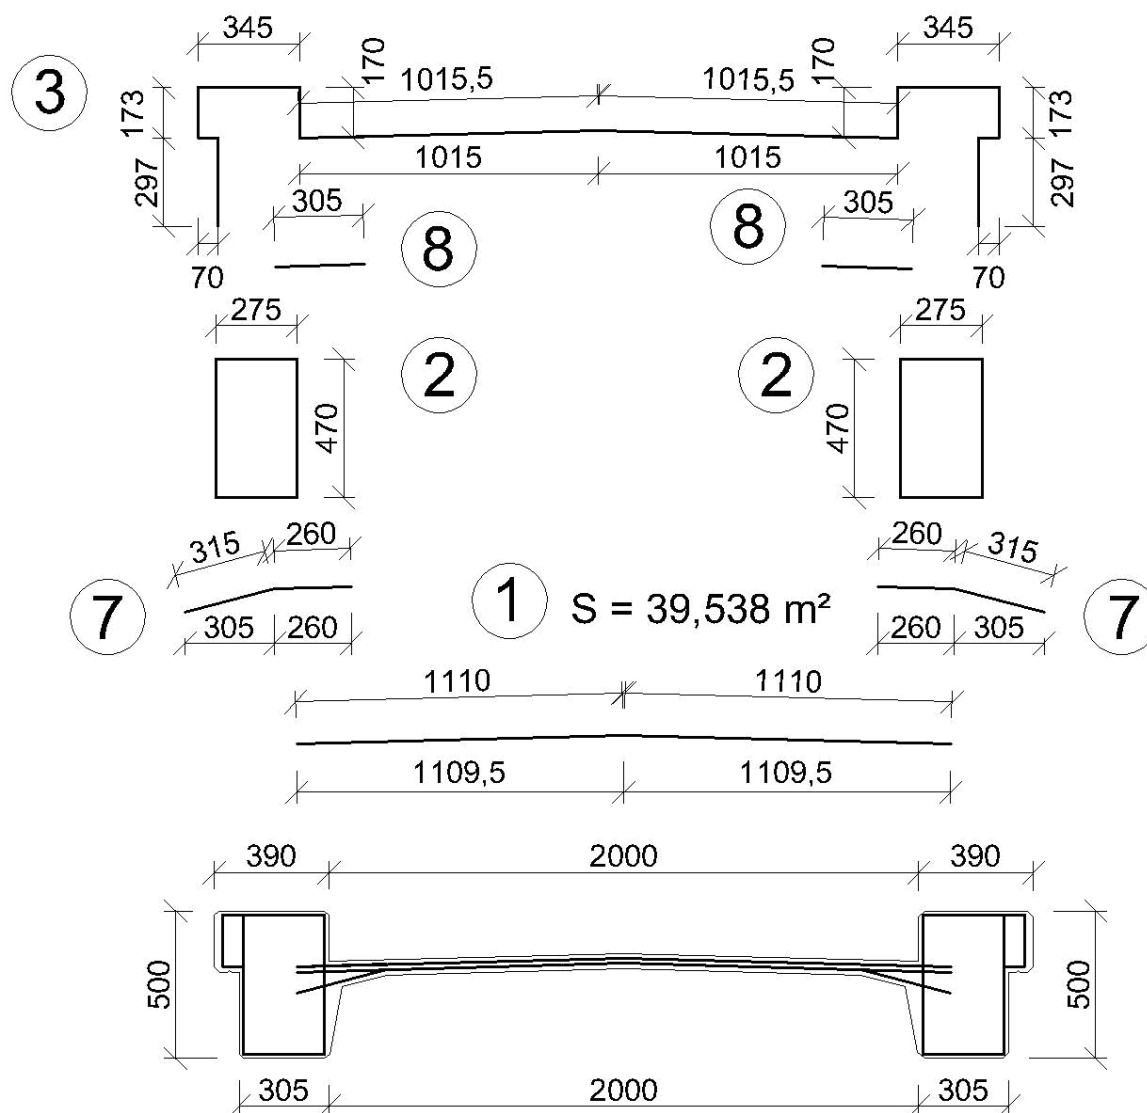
Reinforcement scheme of longitudinal-going textile meshes
